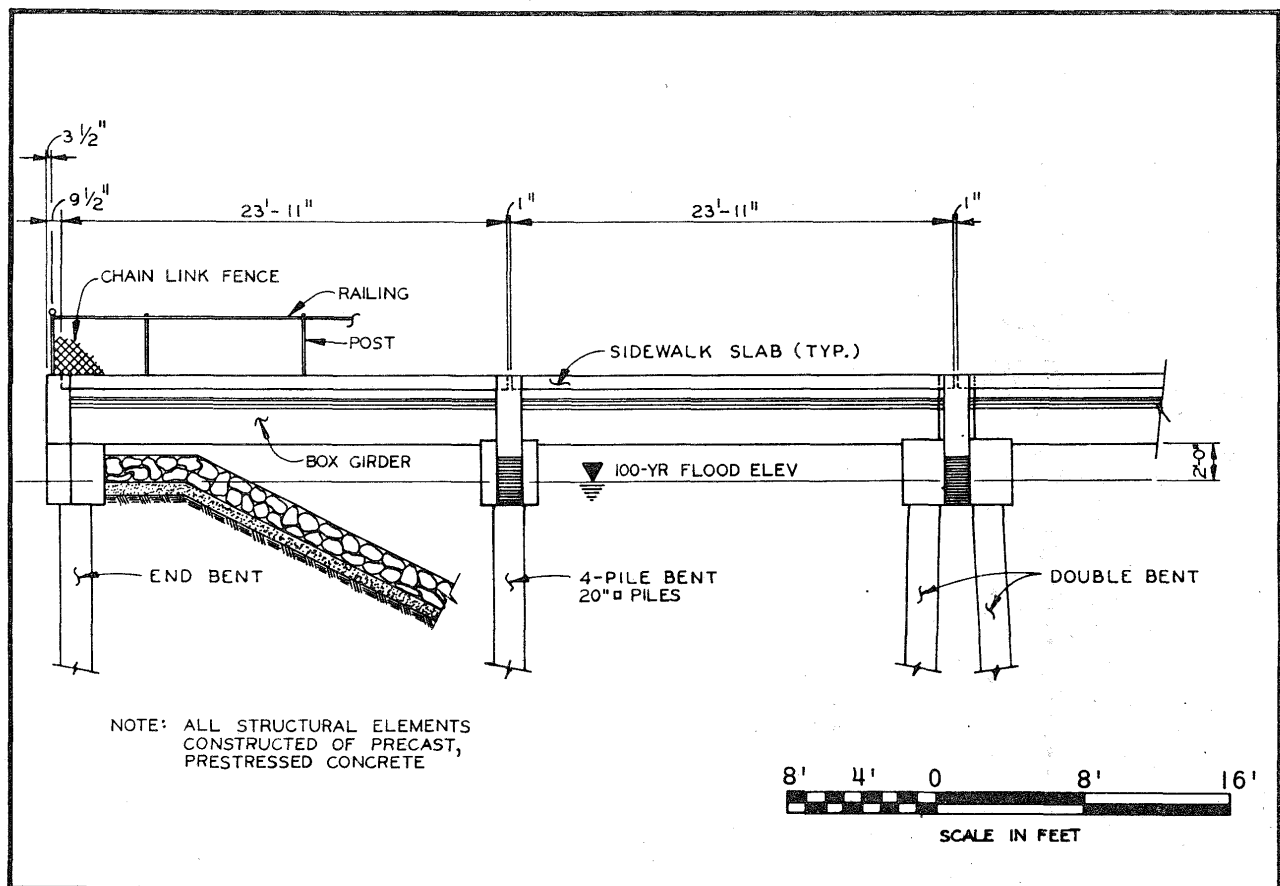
TYPICAL RAILROAD TRESTLE DETAIL
